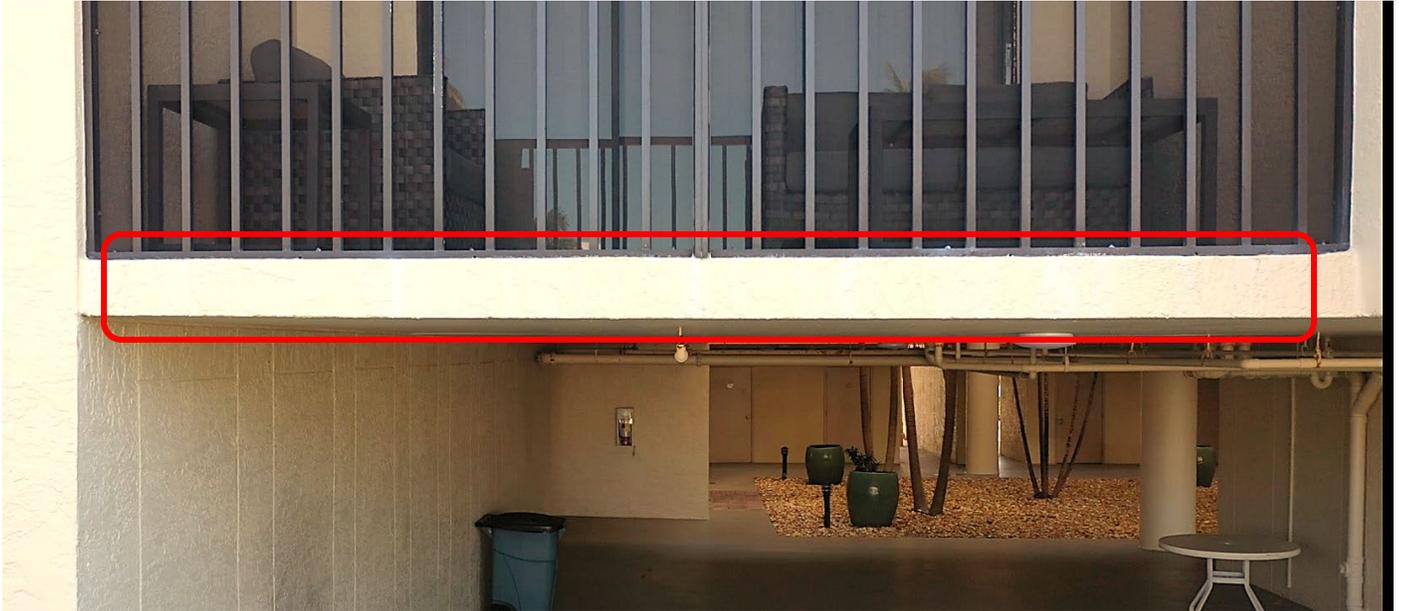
North Stairwell at 5th Level – Example of Stain Mark on Exterior Edge.
